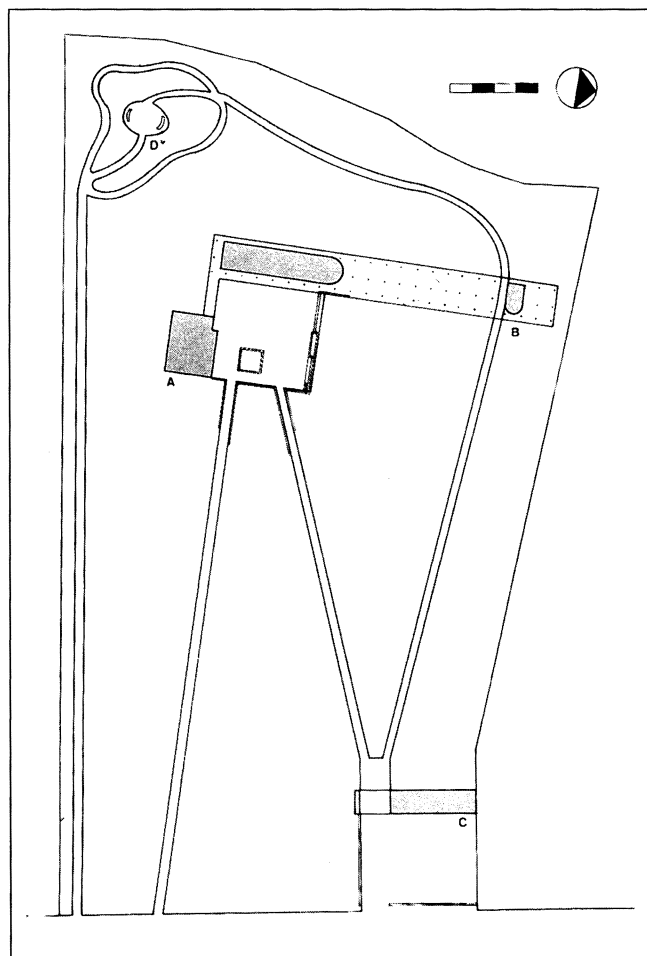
Proposed site plan: (A) communal block; (B) living block; (C) mechanical laundry building; (D) lookout point, c. 1928. Author's drawing after the original, 1990
